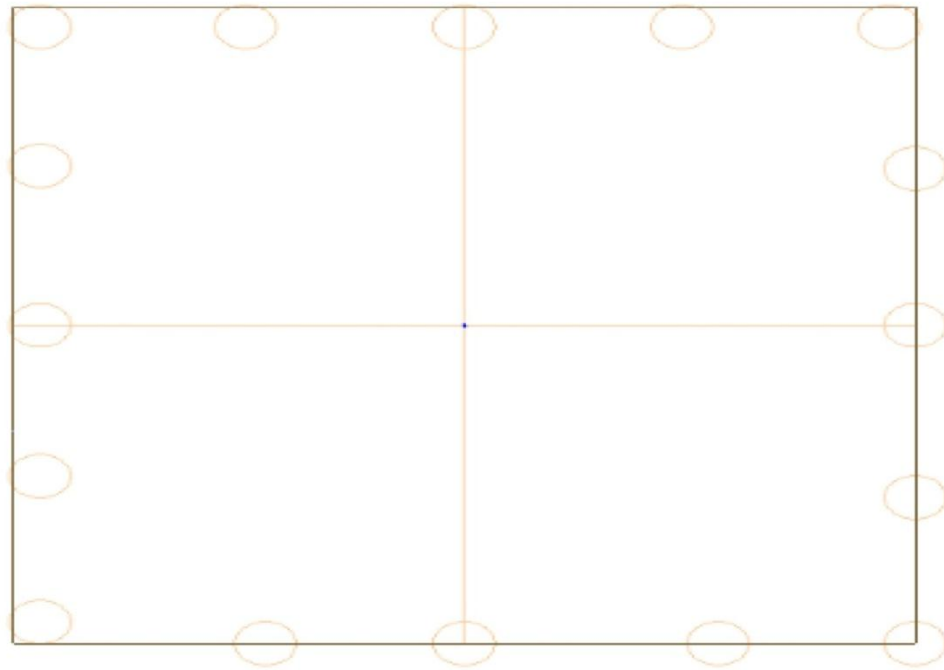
Floor Plan of High Mast Lighting Arrangement.
